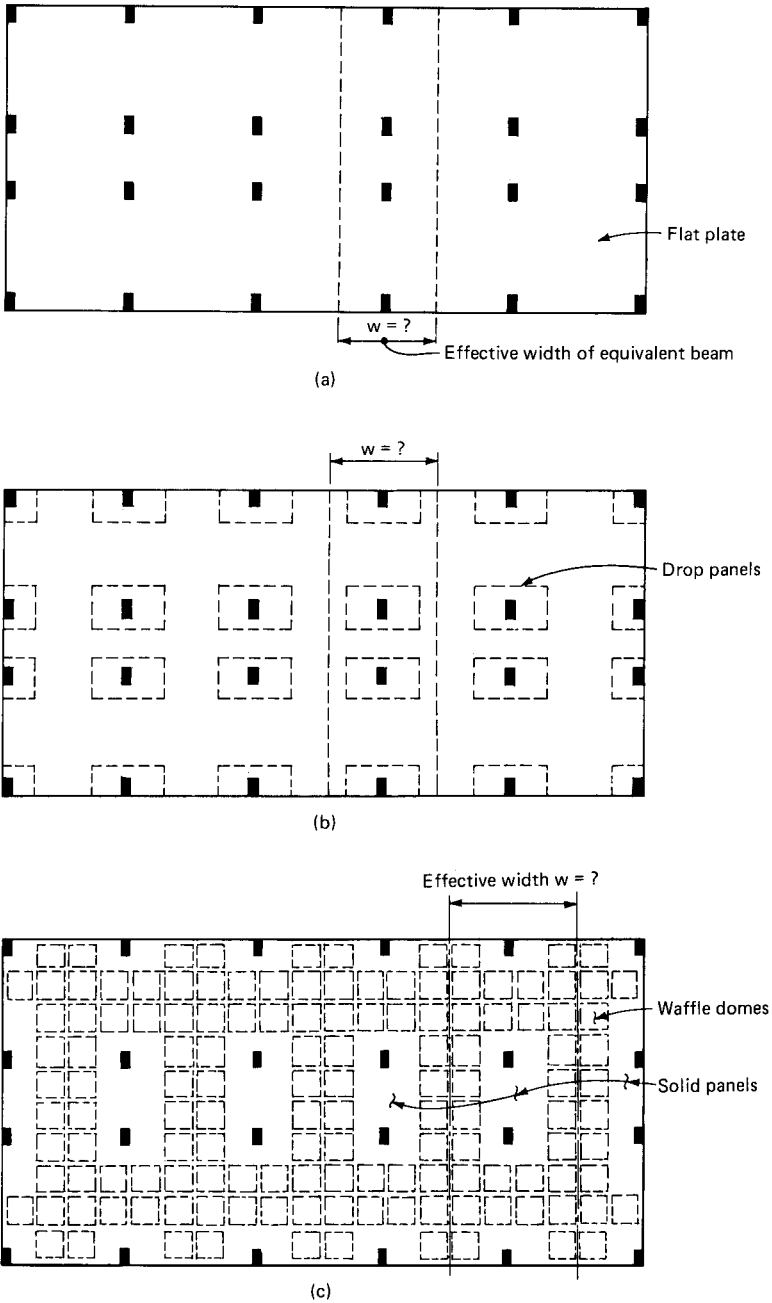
Lateral systems using slab and columns. (a) Flat plate; (b) flat slab with drop panels; (c) two-way waffle system.
